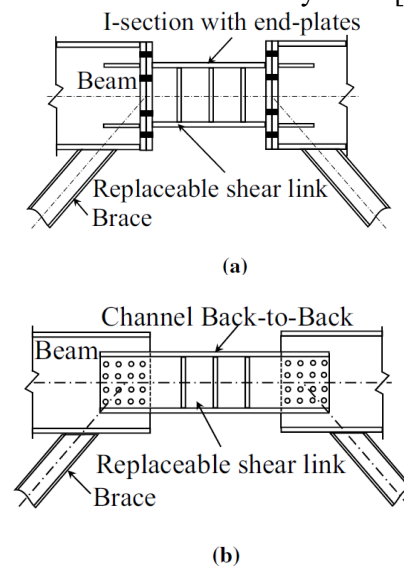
Two configurations of shear links of eccentric braced frames (EBFs), (a): constructed using I-shaped section with end plate, (b): constructed using channel section with back-to-back flanges [12].
